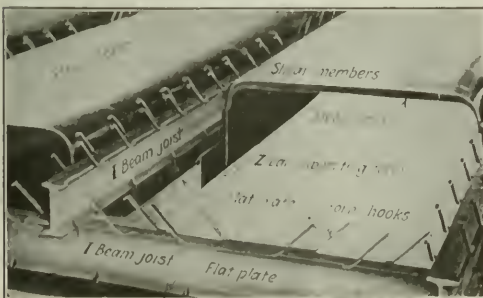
I-BEAMS WITH INTEGRAL SHEAR MEMBERS FORM REINFORCEMENT FOR CONCRETE
